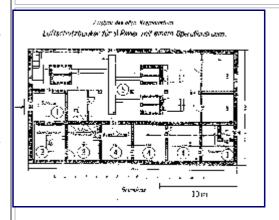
Ground plan of crematorium I Auschwitz I Main Camp after conversion to air raid shelter, 1944.[166]
